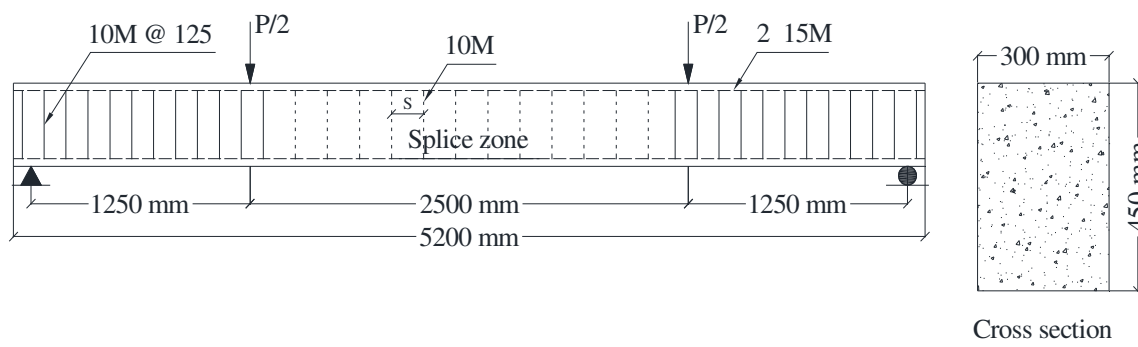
Details of the geometry and transverse reinforcement of the test specimens (Note: stirrup spacing within splice zone (s) is provided in Table 6-1)
